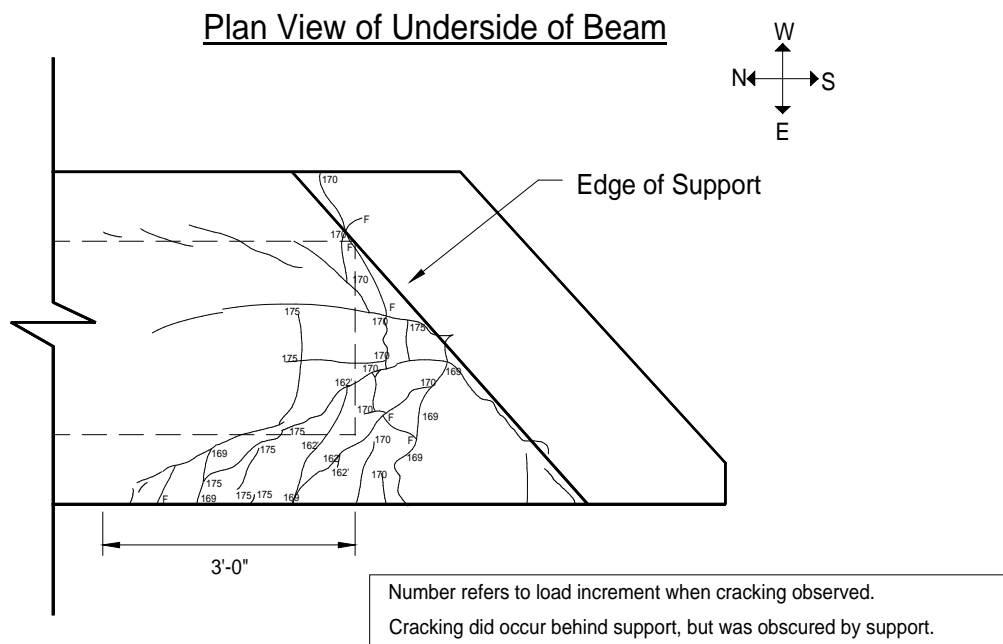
Crack Map of Beam Bottom Flange - Test 1
